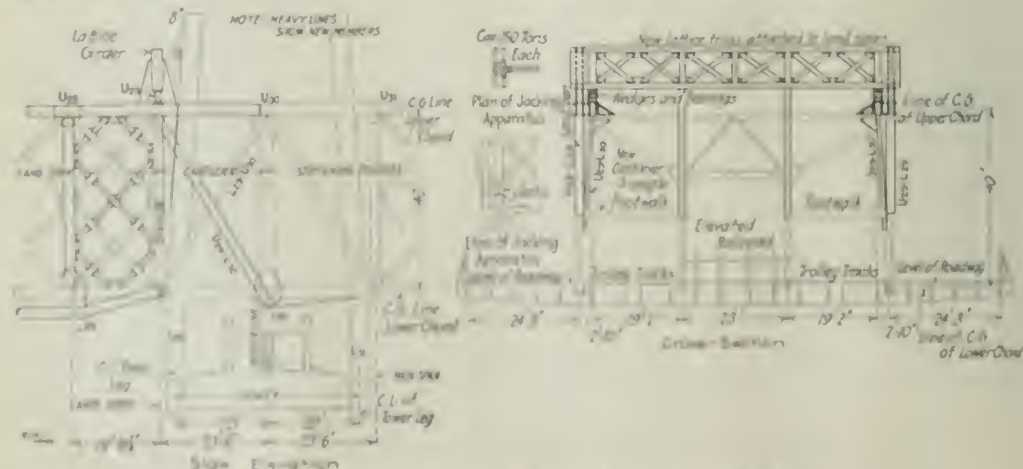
Side Elevation Near Panel-Point 29, Williamsburg Bridge
